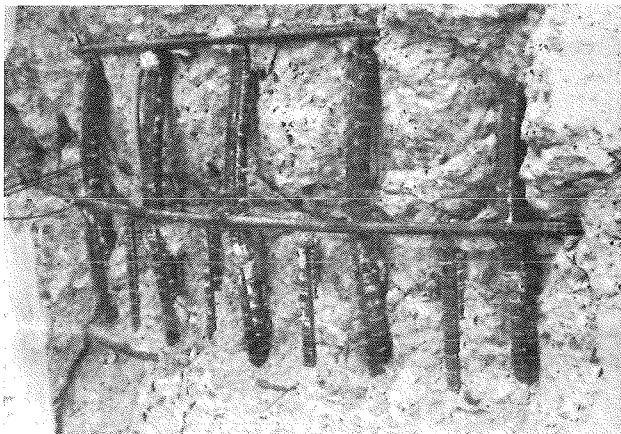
Buckling of Axial Reinforcements of Bridge Pier at the Section of Cut-off
